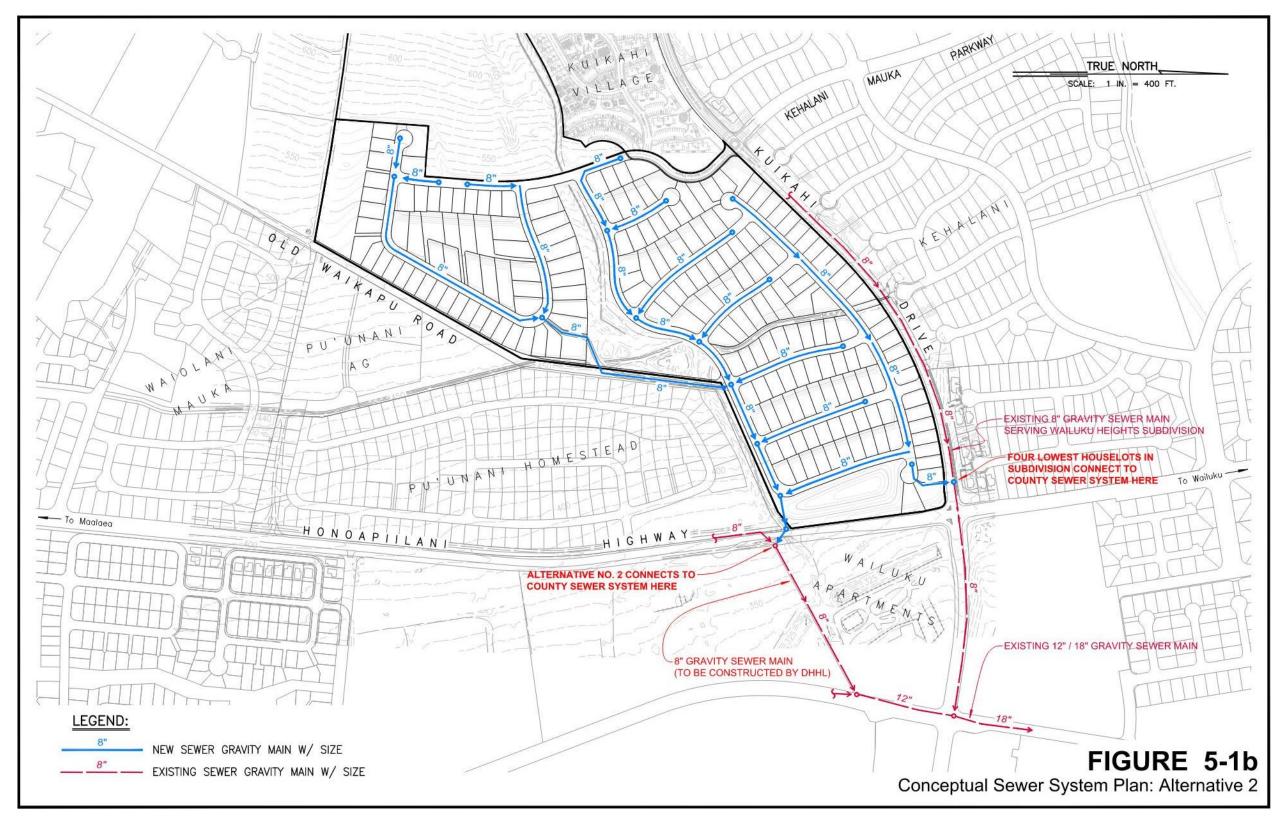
Conceptual Sewer System Plan: Alternative 2
